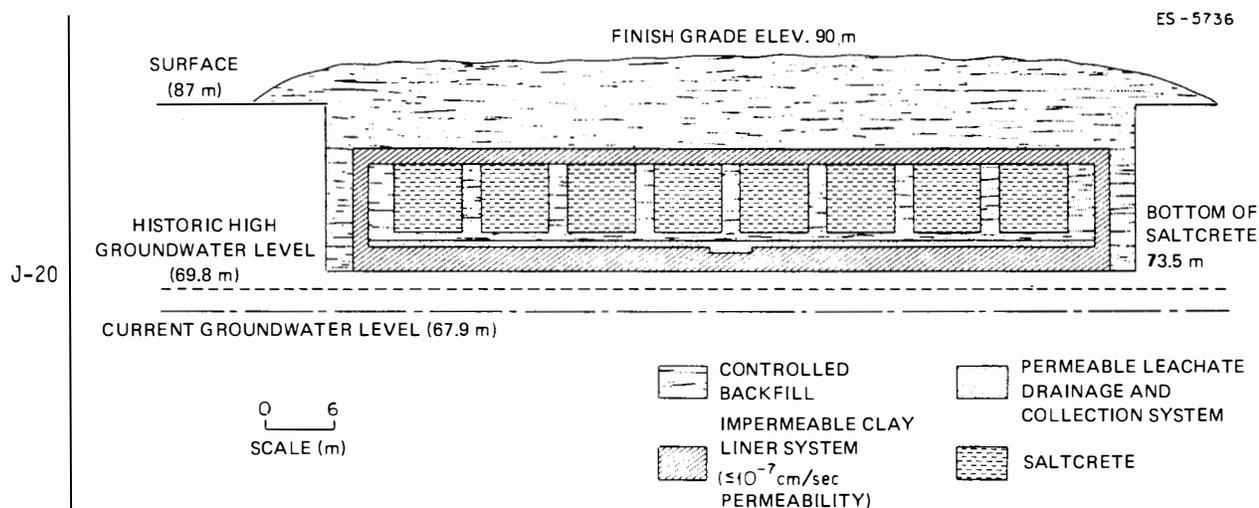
Typical vertical section, engineered landfill for burial of saltcrete.
